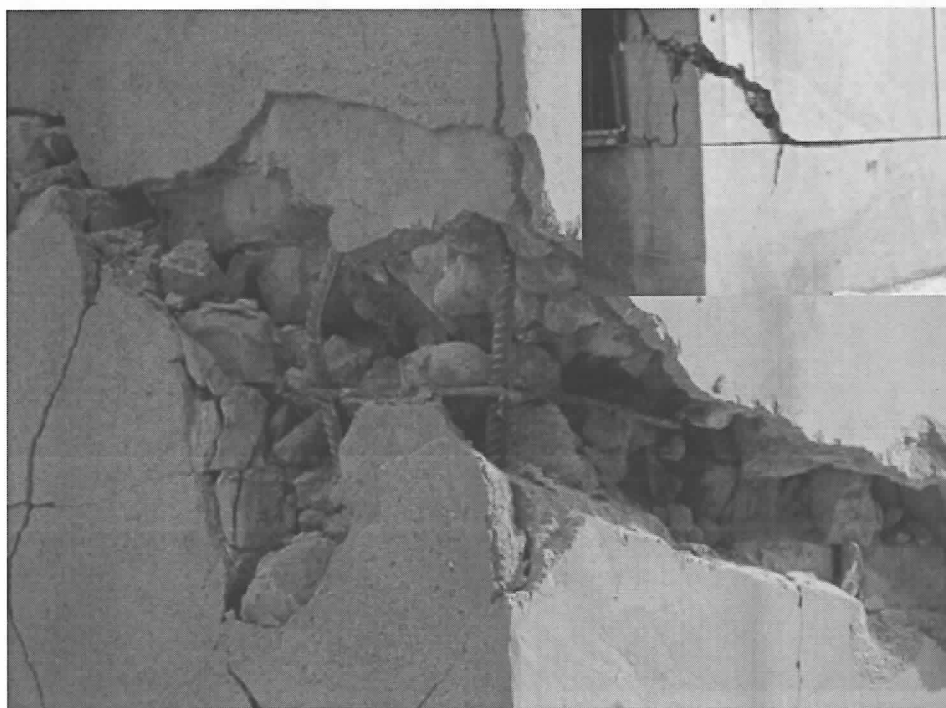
Destruction of structural edge column of masonry structure in Mianzhu
